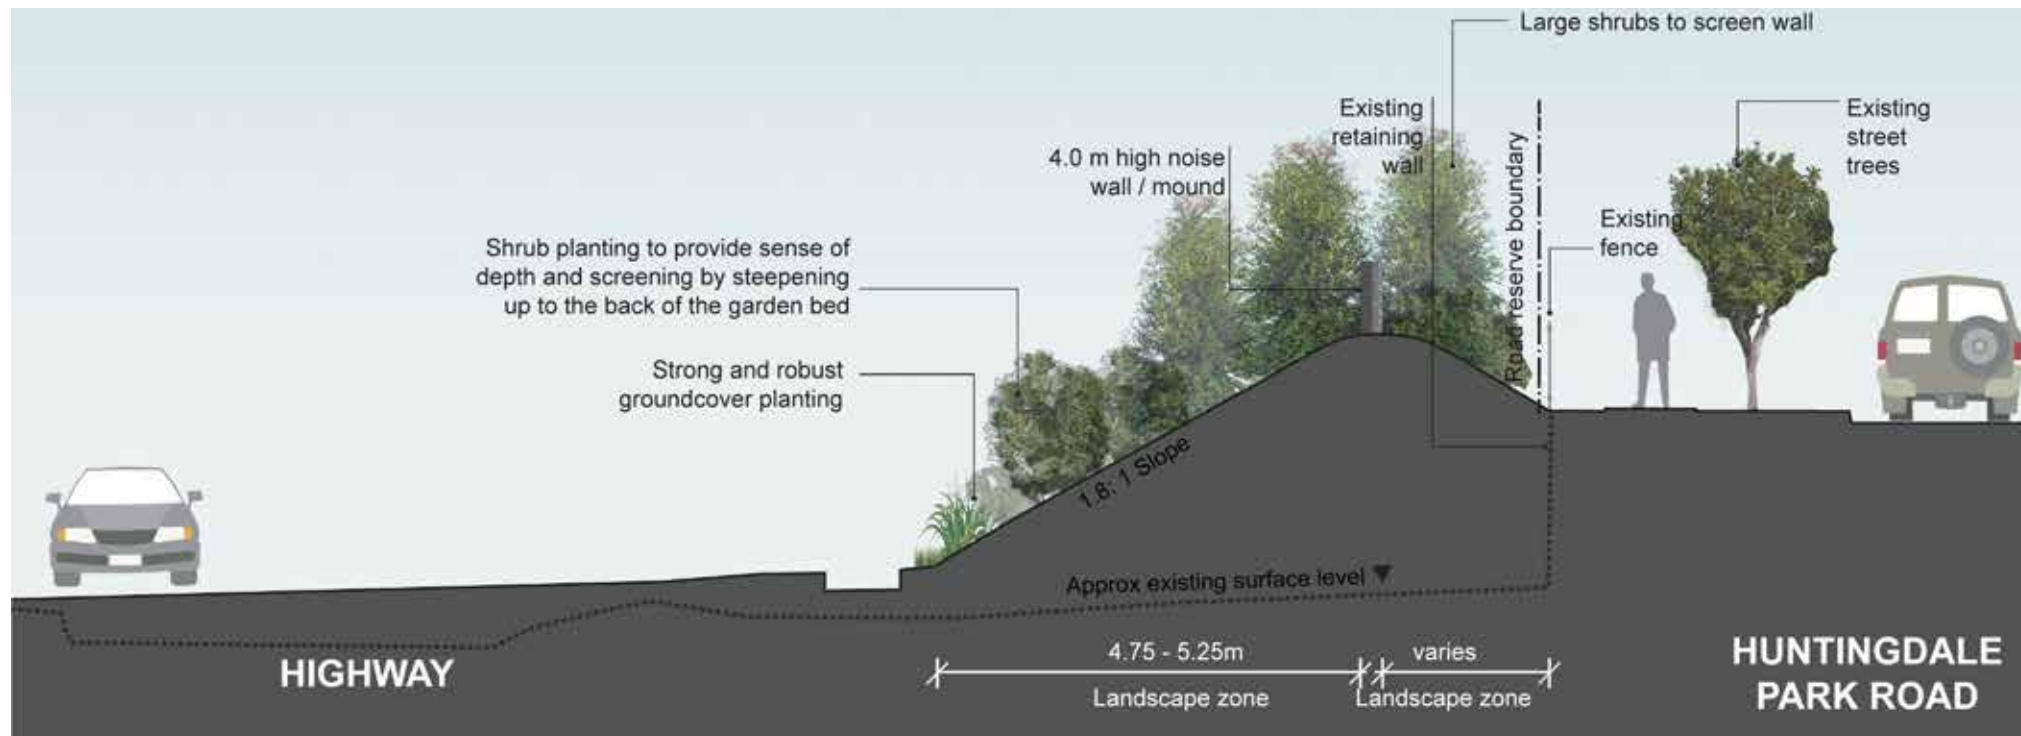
Huntingdale Park Road noise wall NB02 - Cross section of the mound/wall (Scale: 1:50@A3)
